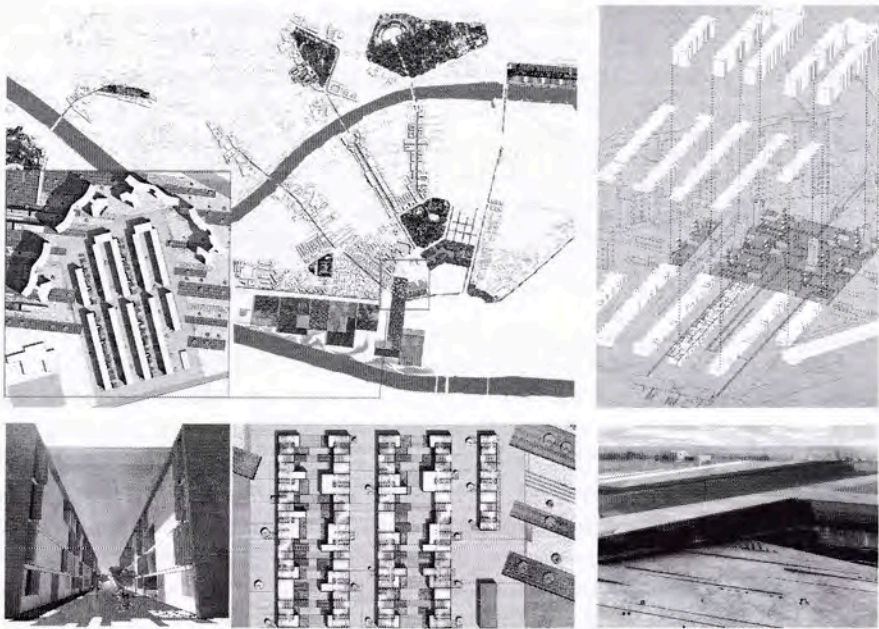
Site plan. Axonometric. Perspective and plan. Aerial perspective.
